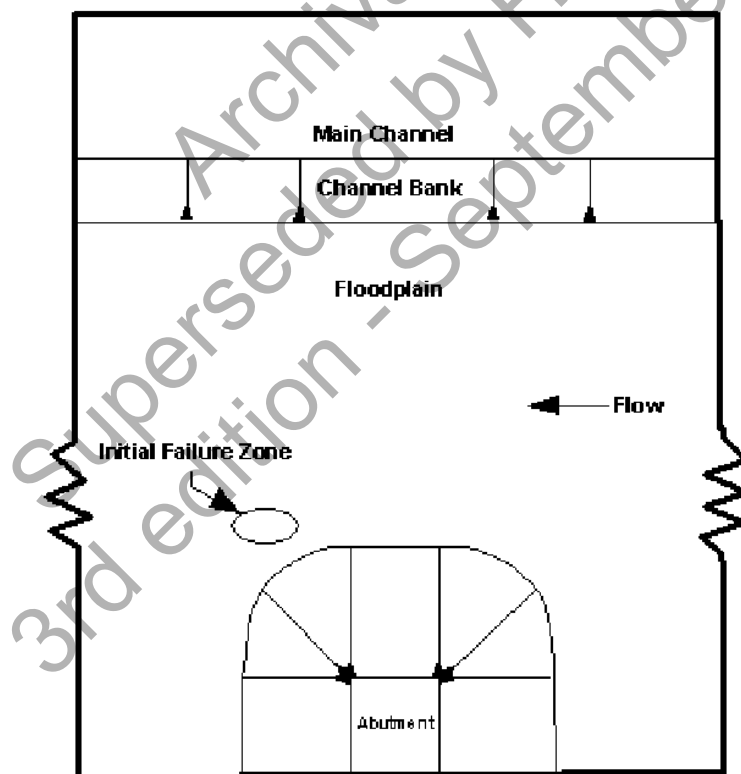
Plan view of the location of initial failure zone of rock riprap for spill-through abutment.
